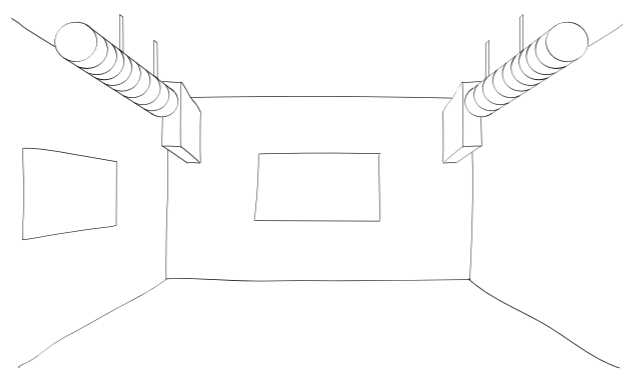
Typical diffuser grille arrangement above a suspended ceiling
